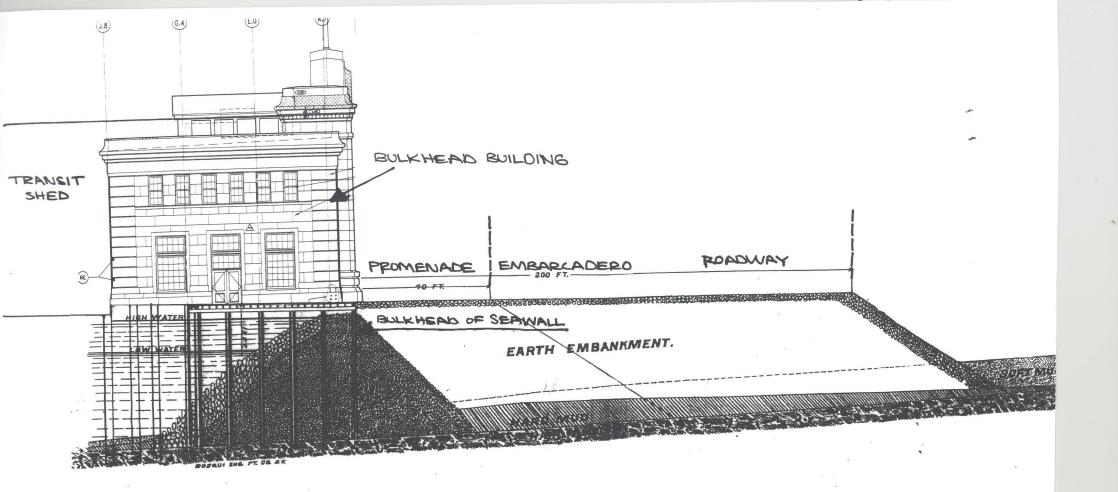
Modified design of seawall, construction begun 1909. H.J. Brunnier, Engineering Department. Source: Newman 1915:326.
